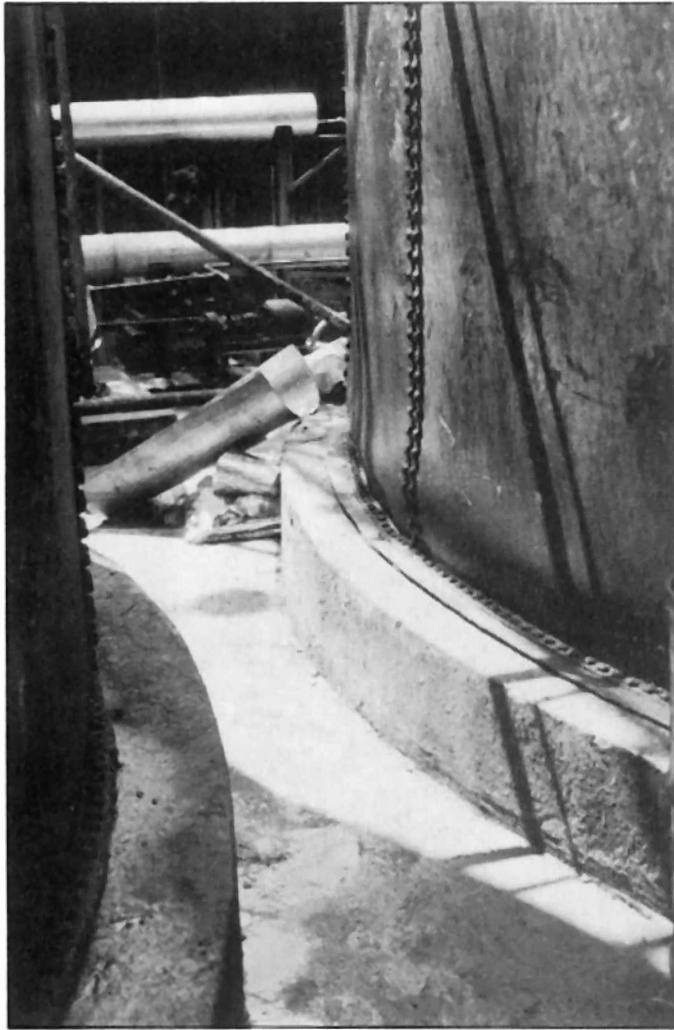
DAMAGE TO TANK AT EL DORADO PLANT.
